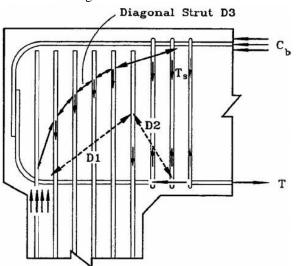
External Vertical Joint Reinforcement for Joint Force Transfer
